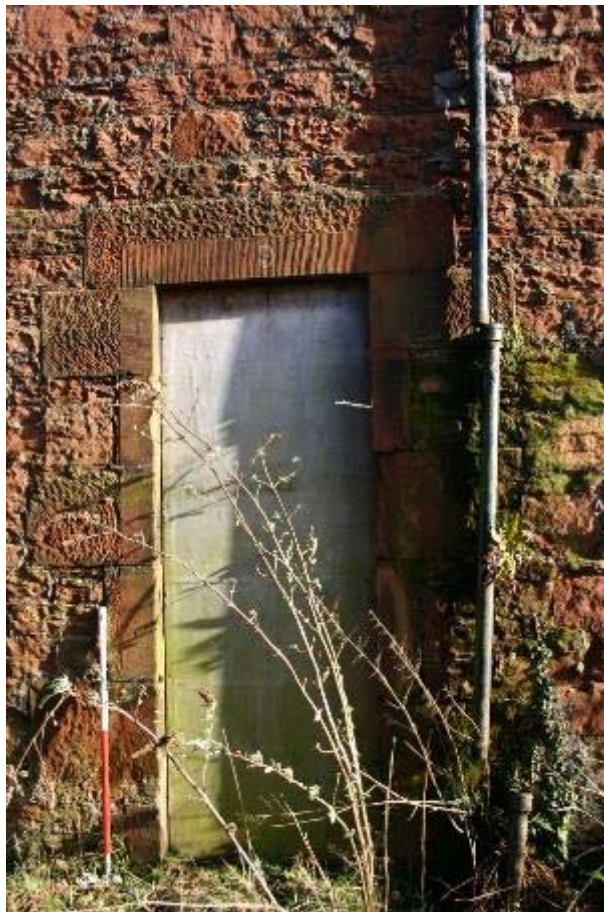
West facing elevation, doorway with No 9 of mid to late 19<sup>th</sup> century possibly residential building of No 25
